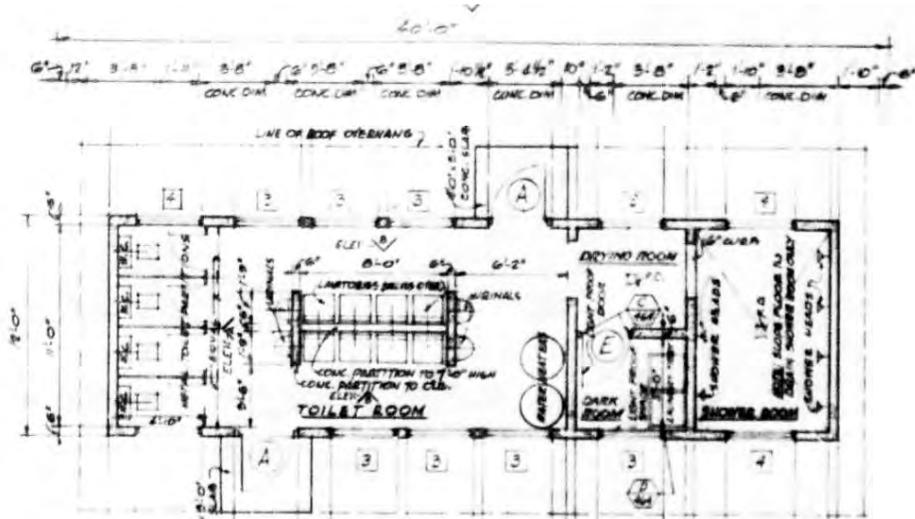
As Built plan and elevation views of NTTU training area toilet facilities found in Kagman and Marpi.
